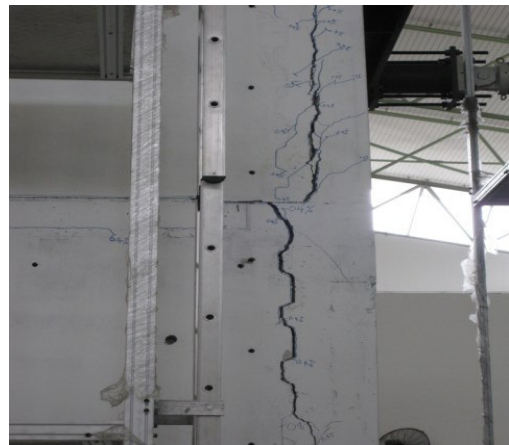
Wider cracks were observed at joint wall-column interface during +0.5% drift.
